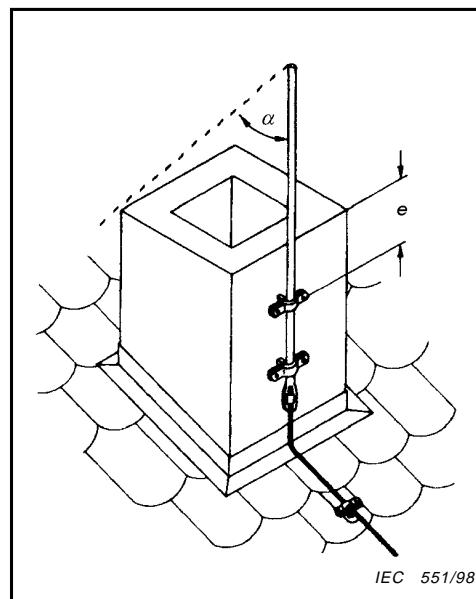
Construction of air-termination rod for protection of chimney using the protective angle air-termination design method
